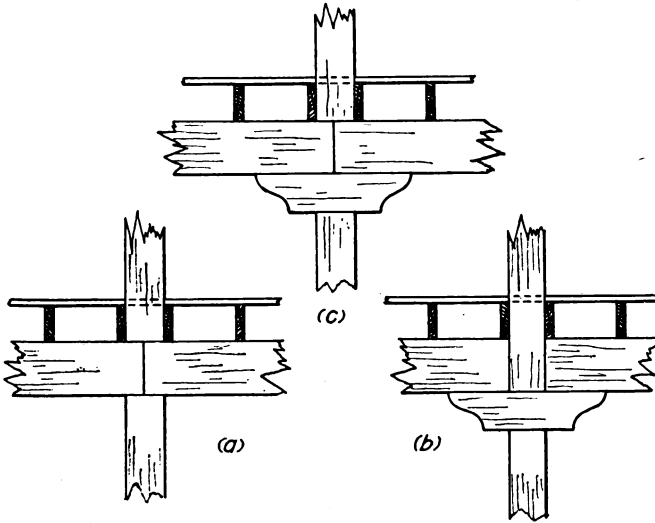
EXAMPLES OF DEFECTIVE DETAILS.
